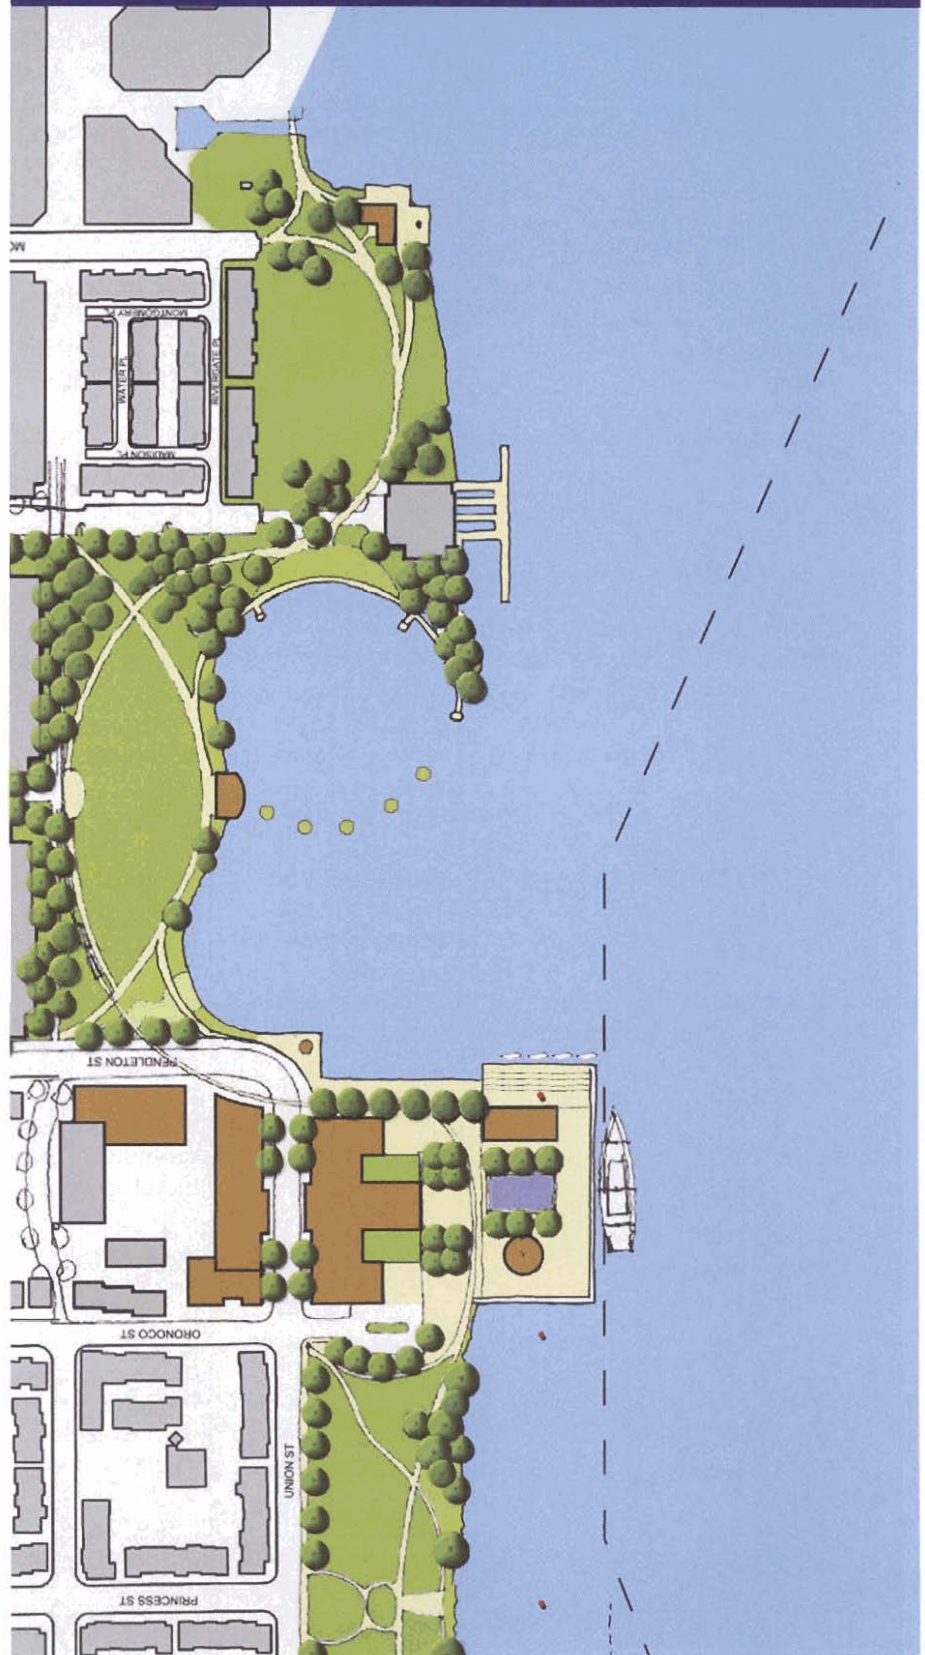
Waterfront Early Concept Illustrative Plan (May 2010) - South Section
